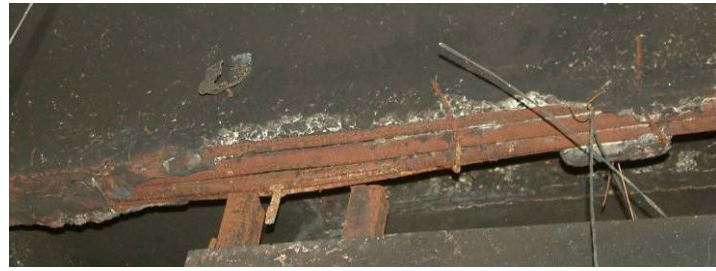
Characteristic damages of improper reinforced rib due to fire
